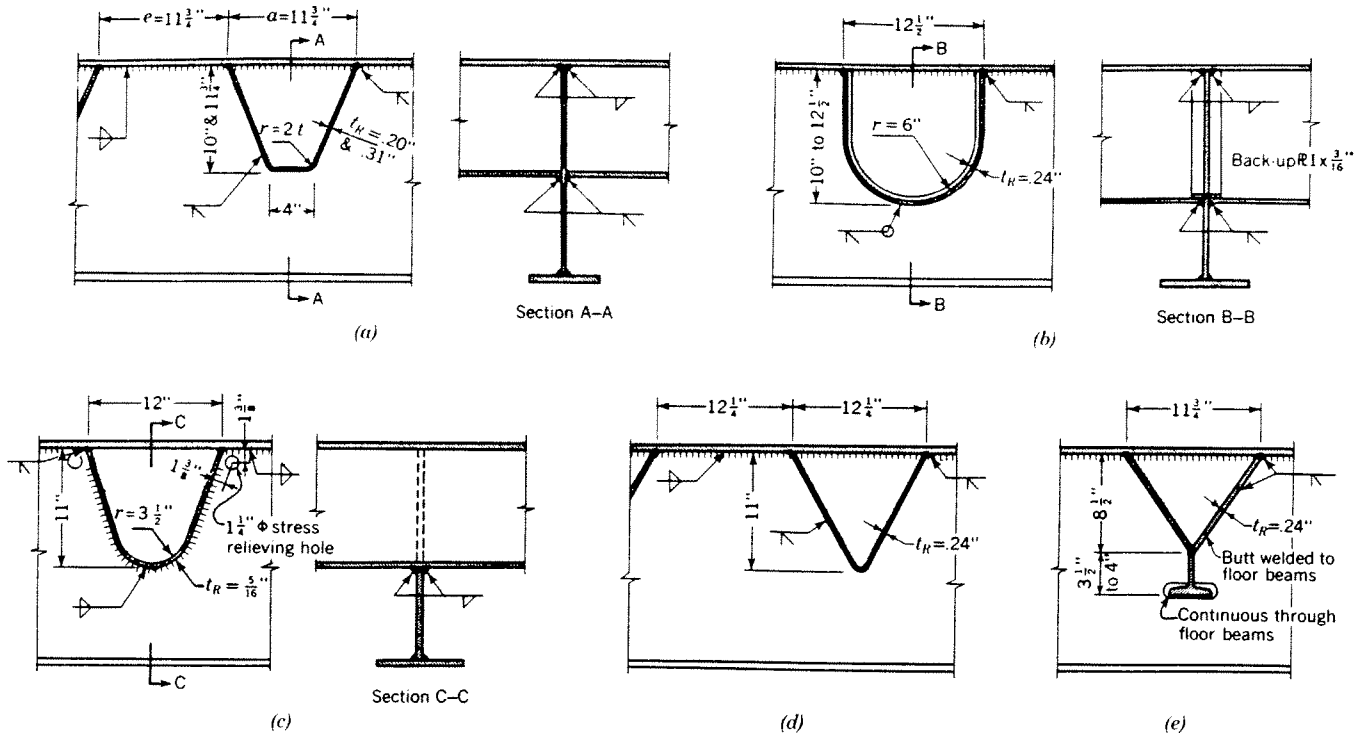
Typical cross sections of closed ribs: (a) Mannheim-Ludwigshafen Bridge [77], see Fig. 7.20. (b) Weser Bridge Porta [60], see Fig. 1.12. (c) Port Mann Bridge [22, 62], see Fig. 1.24. (d) Haseltal Bridge on the Frankfurt-Wuerzburg Autobahn [72]. (e) Fulda River Bridge, Bergshausen [72], see Fig. 1.26
